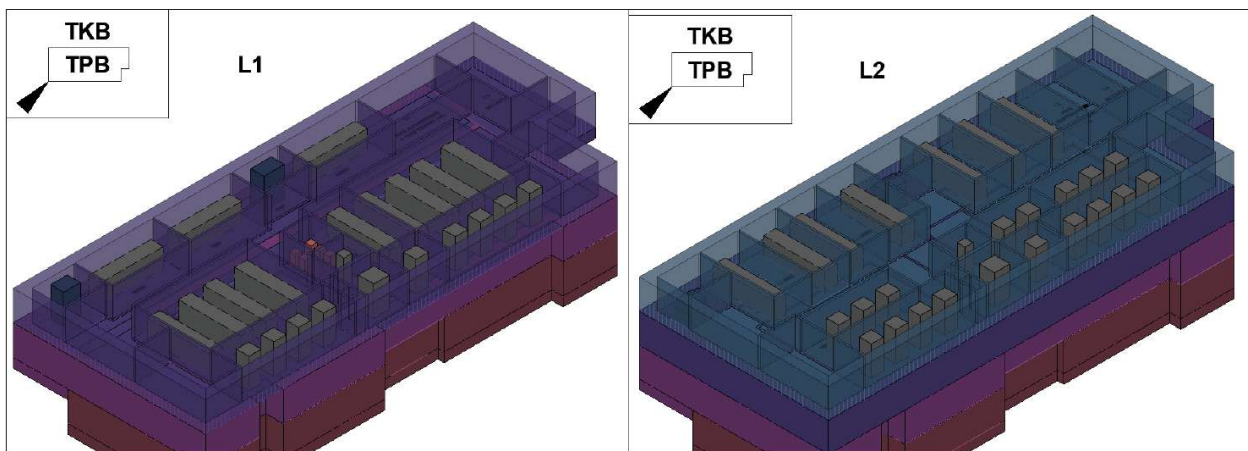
3D view of levels L1 and L2 of the tritium plant building.
